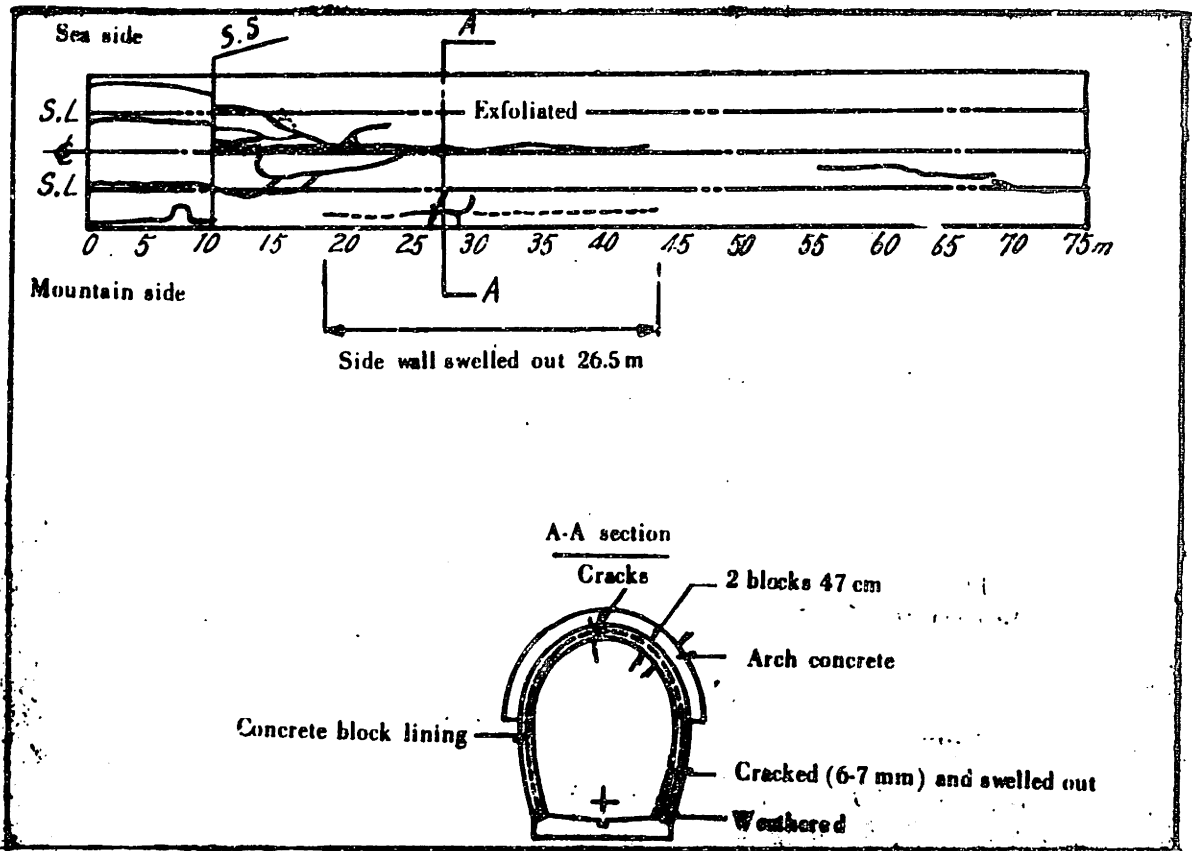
Cracks Found in the Arch Concrete of Terasaka Tunnel (after Okamoto, 1973)
